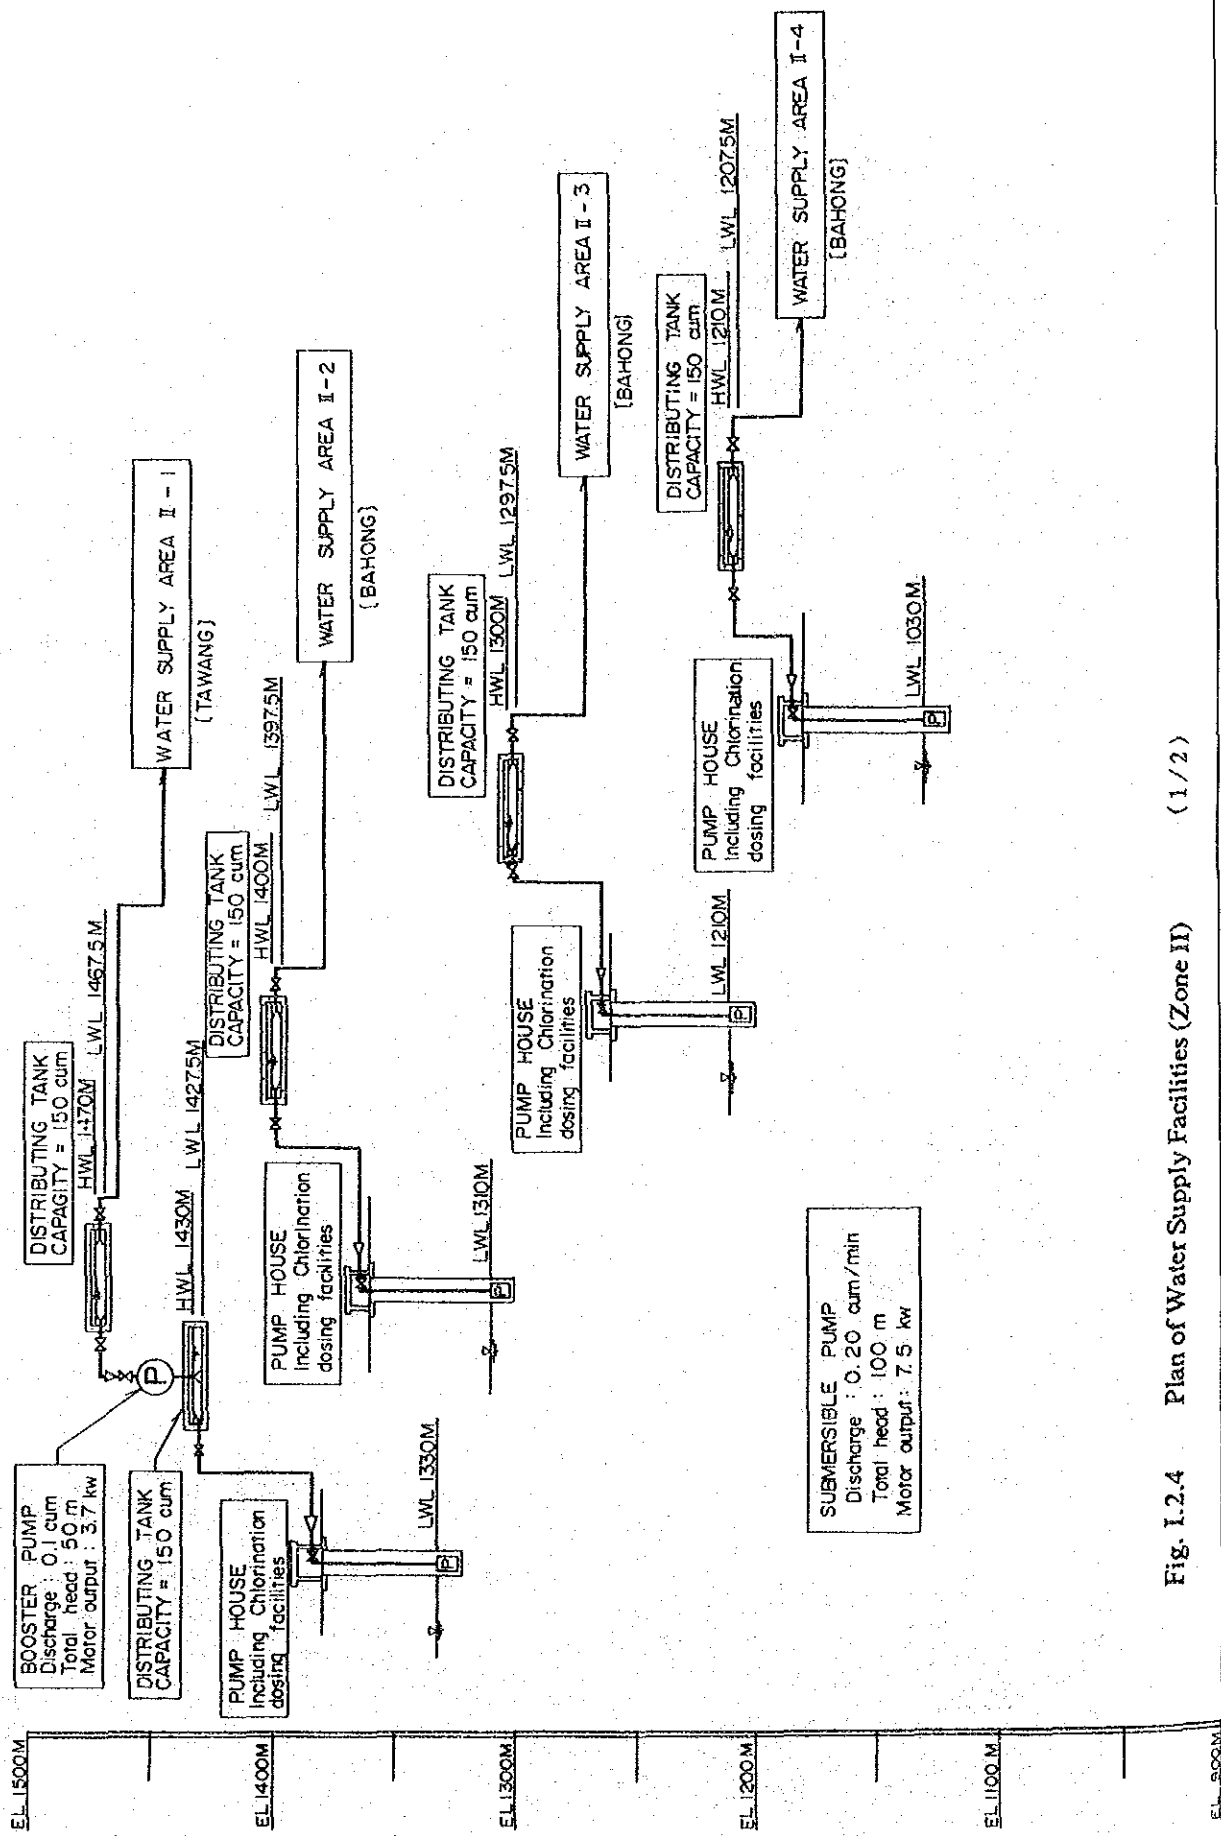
Plan of Water Supply Facilities (Zone II) (1/2)
